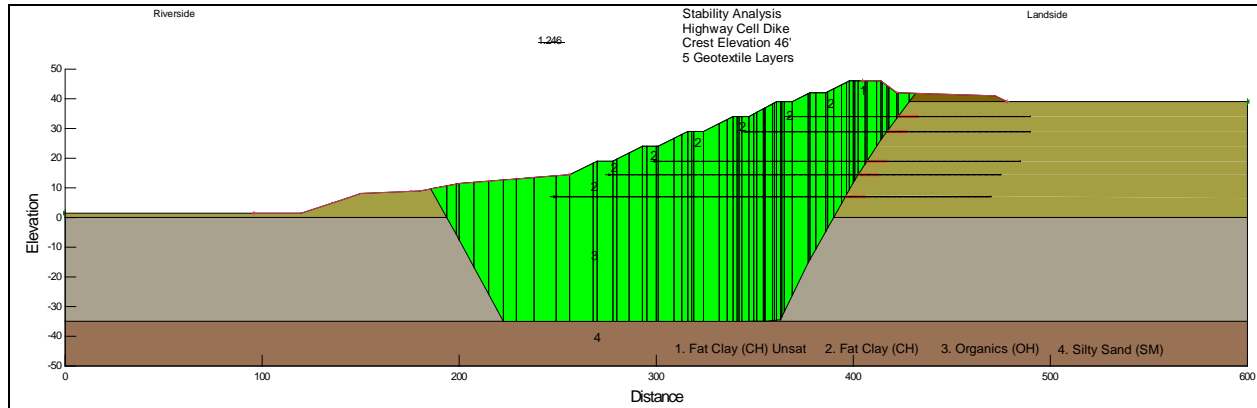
Highway Cell. Elevation 50'. 5 Geotextile layers. FS = 1.246
